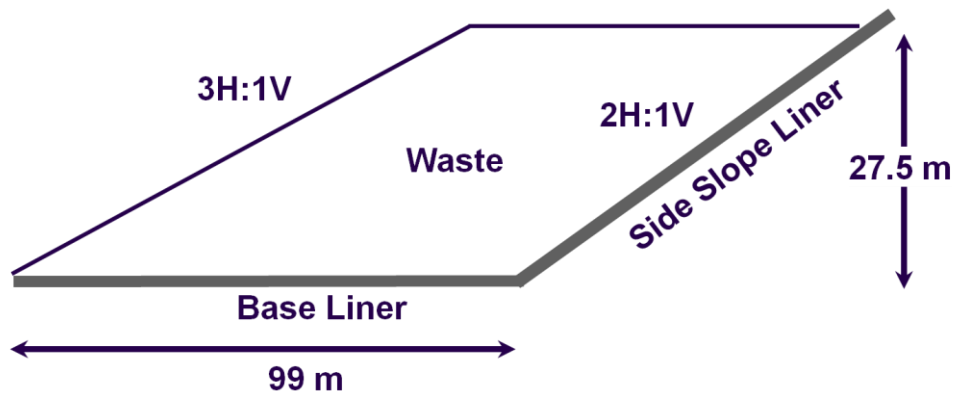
Cross-section through Kettleman Hills Landfill before slope failure.
